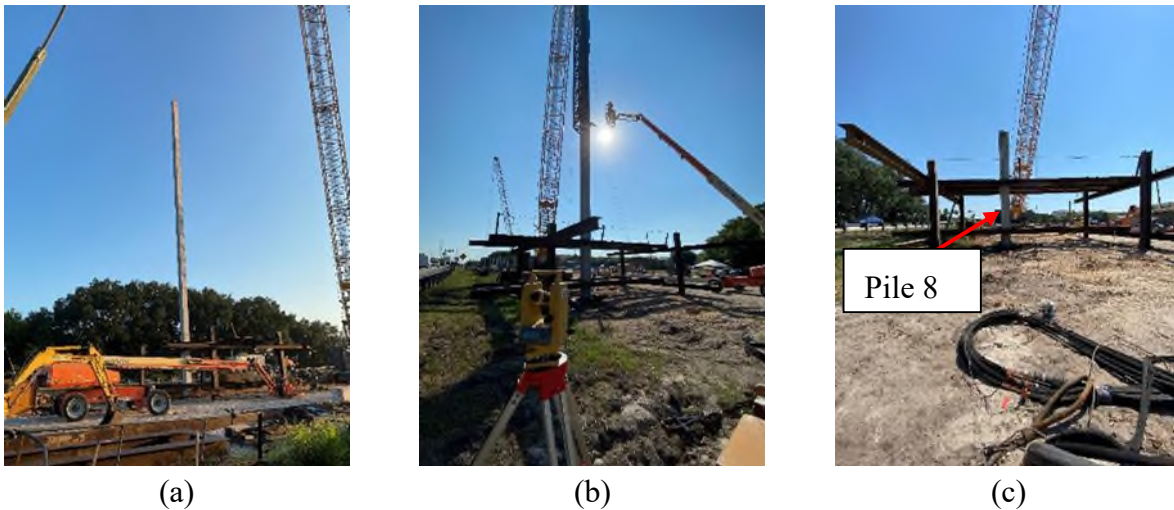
Driving process of pile 8 at Site A2: (a) prior to installation, (b) during installation, and (c) end of installation.
